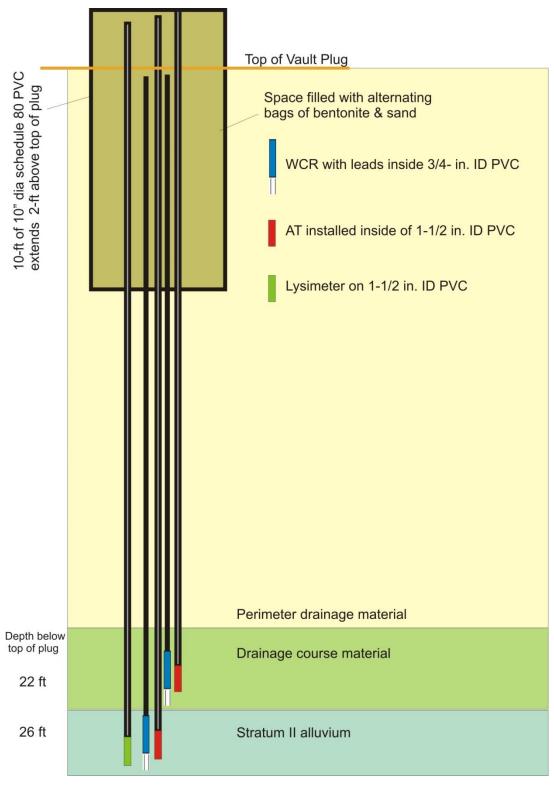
Vertical section showing instrument locations in the MFTC-West and MFTC-East instrumented tubes.
